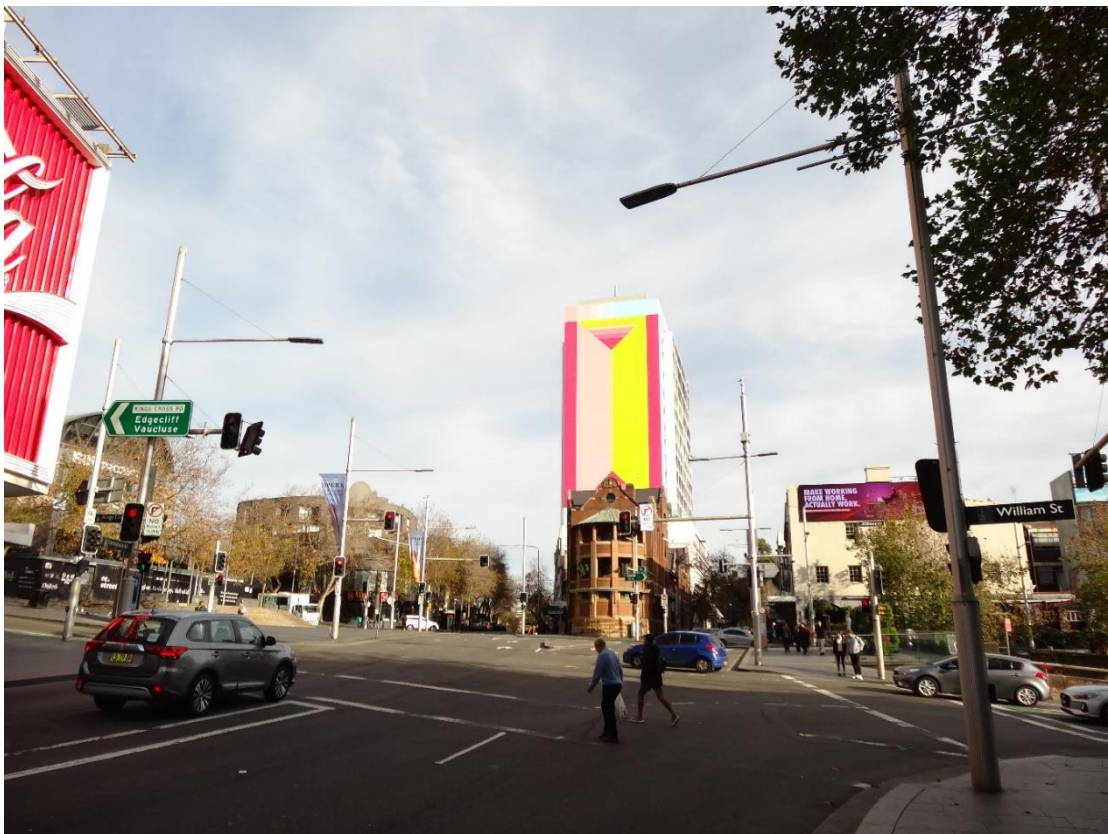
Site viewed from the intersection of William Street, Darlinghurst Road and Victoria Street
